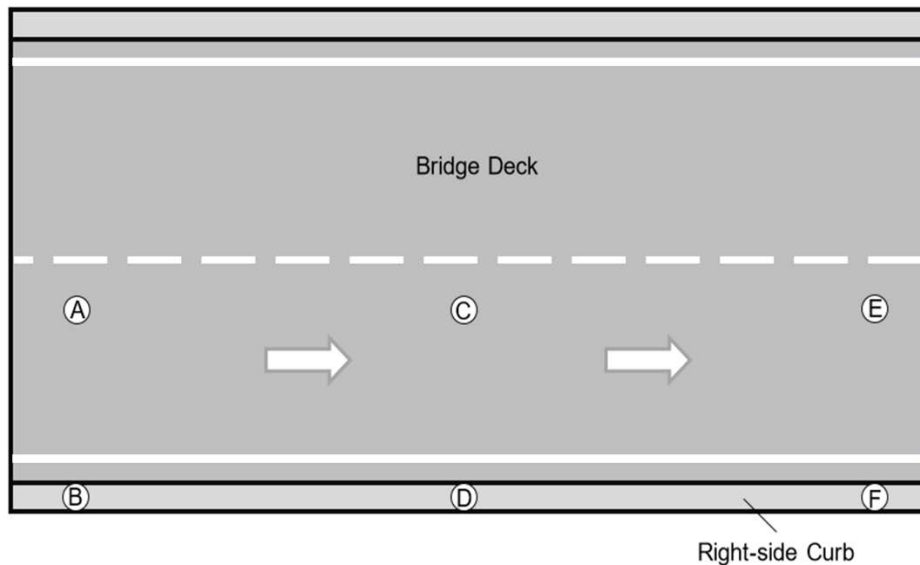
Drilling locations (plan view) on the deck and curb for both two-lane single direction and two-lane bi-directional bridges.
